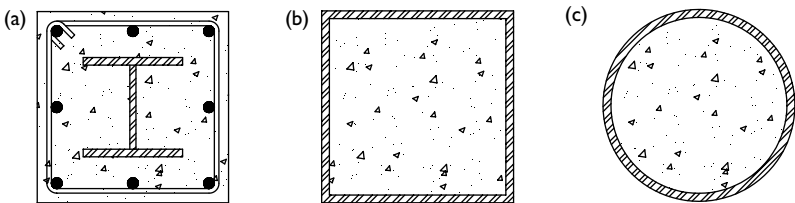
Typical composite columns: (a) encased composite column; (b) concrete-filled steel box column; (c) concrete-filled circular steel tube.
